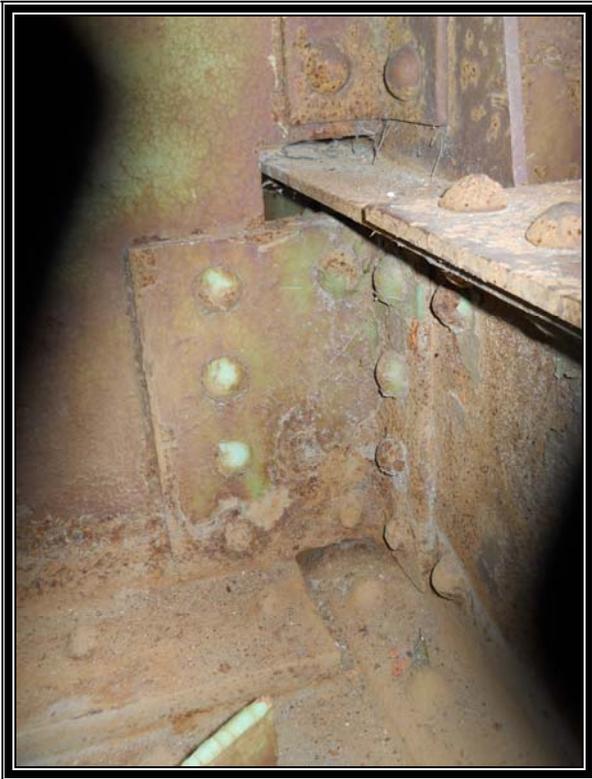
Typical Floorbeam to Truss Connection Angle Rivet Head Loss
